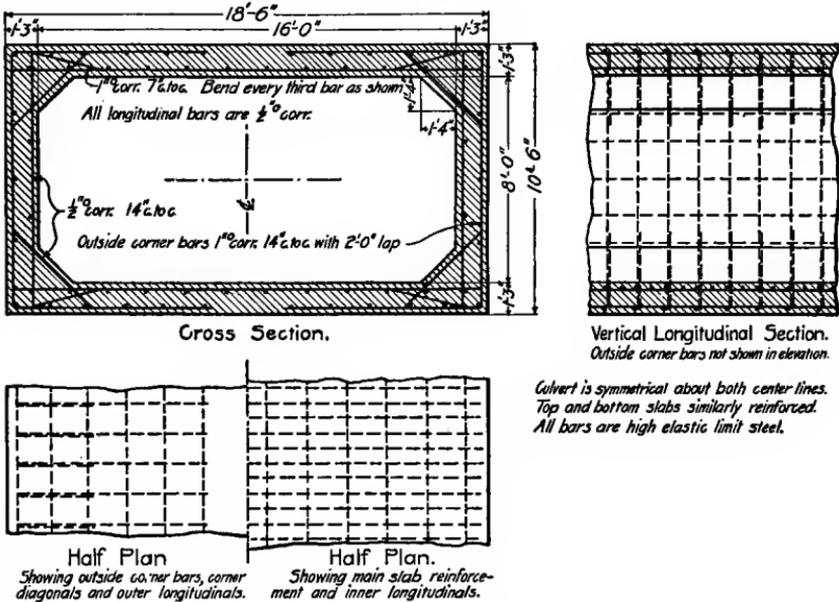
CORRUGATED BAR Co's. BOX CULVERT.
